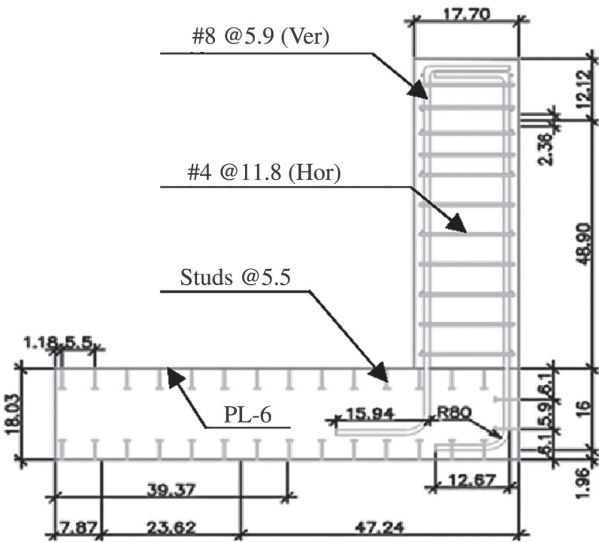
SC wall-to-RC wall noncontact lap splice (L-joint) connection (units: in.) (Hwang et al., 2013).
